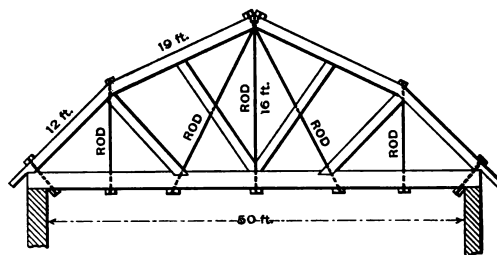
Form of Truss Adapted for a Span Greater than that Shown in Previous Figure.
